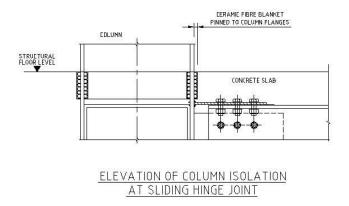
Sliding Hinge Joint Column and Slab Isolation Details.
